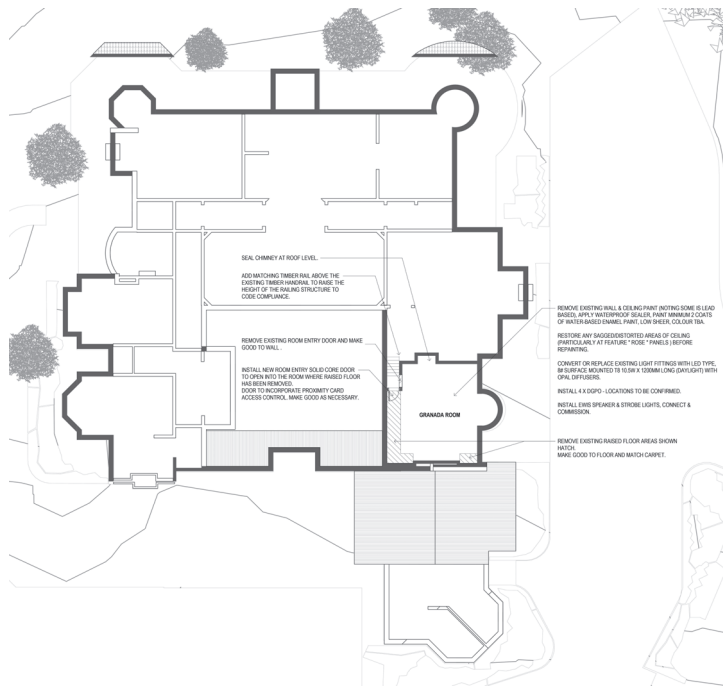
St John of God Richmond Hospital. Proposed First Floor Plan.
